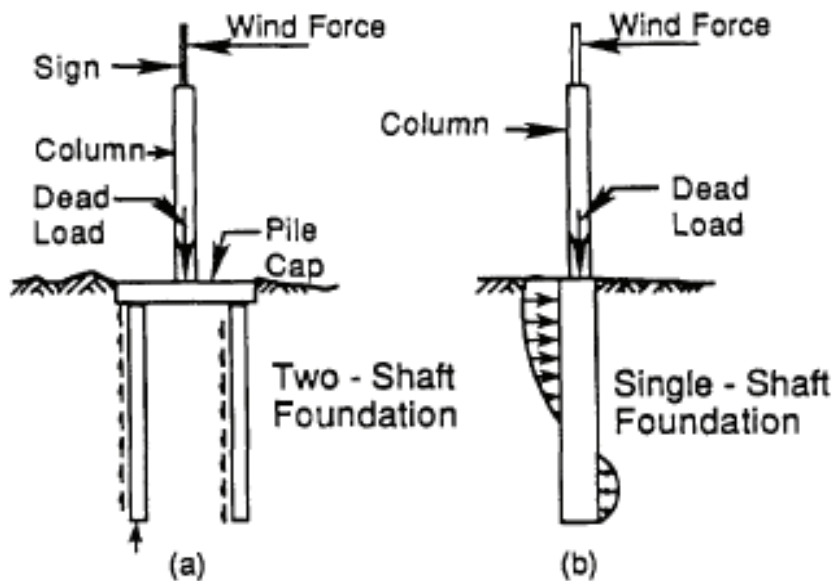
Elevation View of an Overhead Sign Structure: (a) Two-Shaft Foundation; (b) Single-Shaft Foundation (from *FHWA-IP-84-11*)
